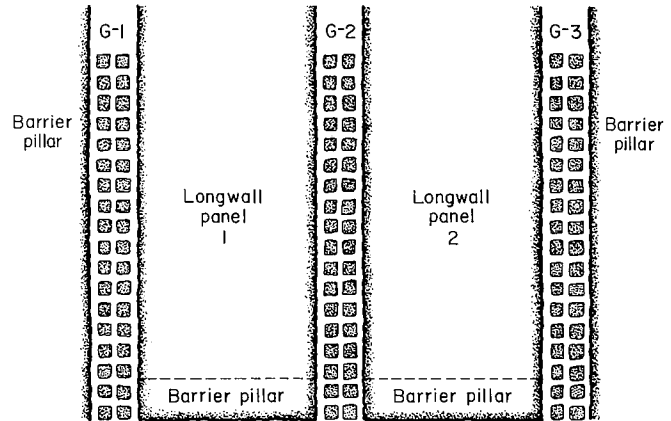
Panel layout for sample problem illustrating the ALPS method.
